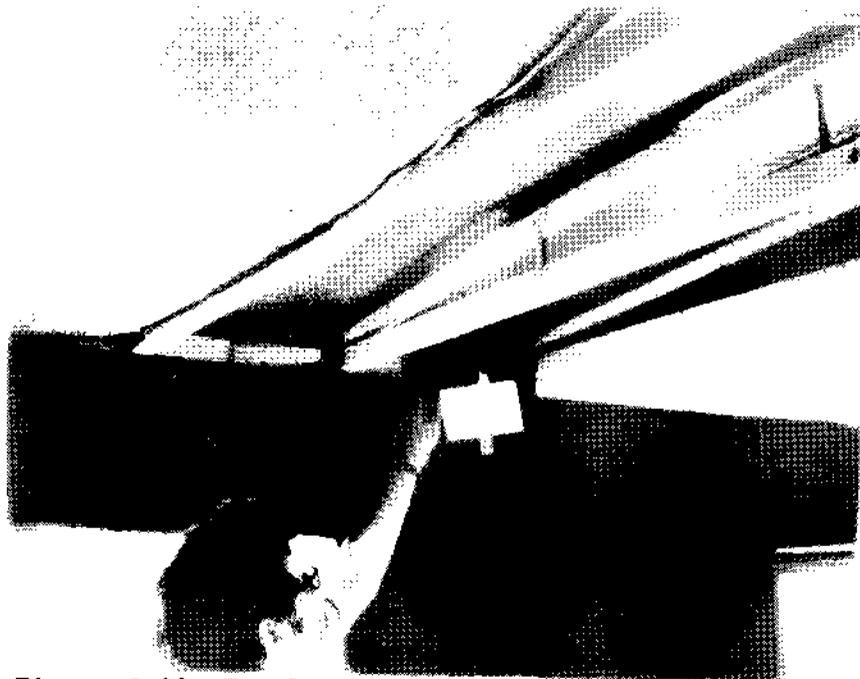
Insulation Missing in Roof System. Note Metal Roofing Loosely Lying on Roof Truss Which Would Likely Result in "Roof Rumble" in Windy Condition
